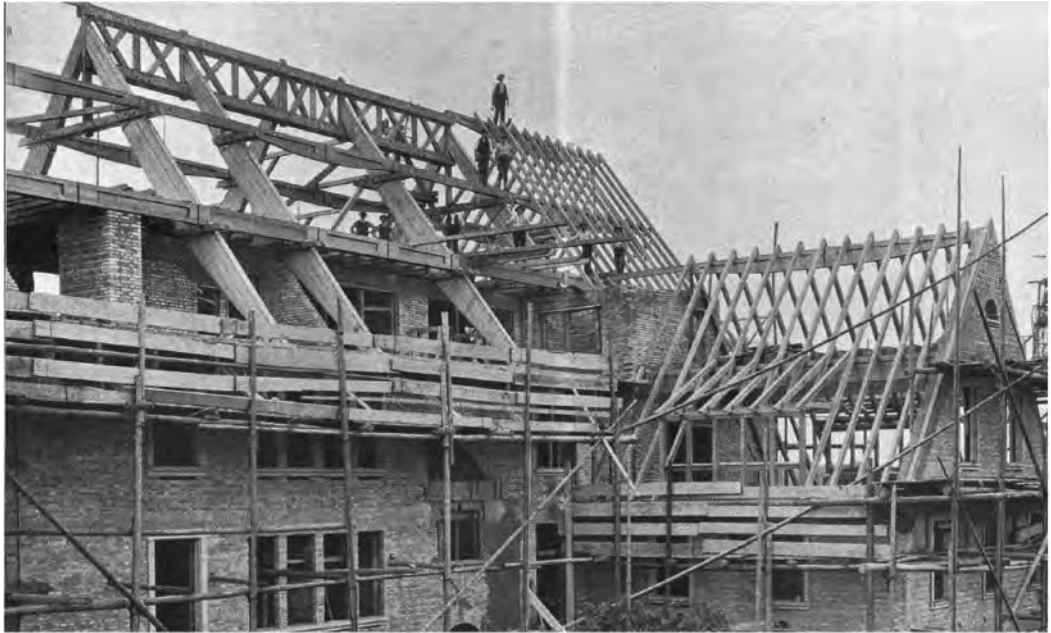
Carpenters on the construction site of the Catholic church in Romanshorn, 1911 (Church archive).
